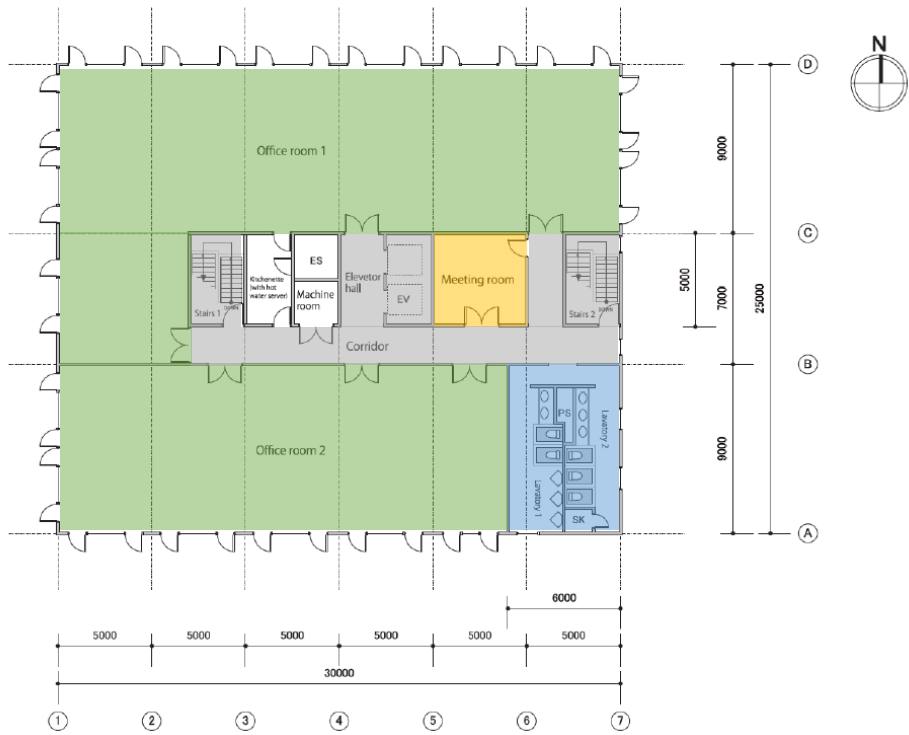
Second case study layout division of ISO 18523-1-2016 - 1st to 6th floor
